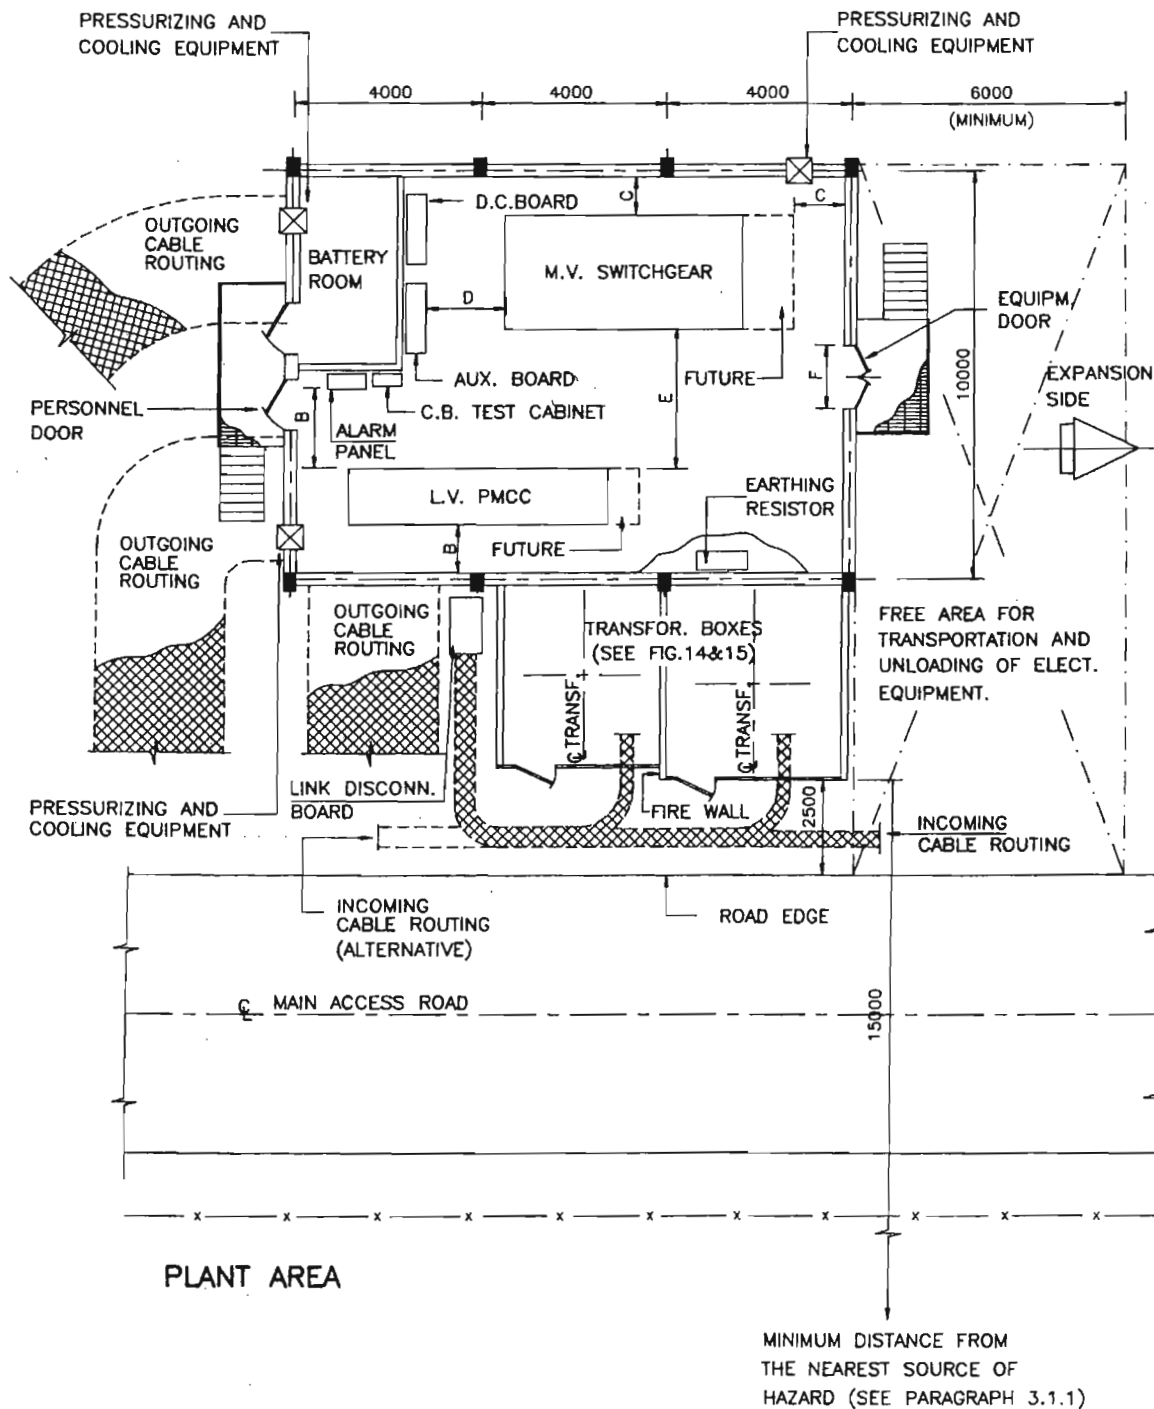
LAYOUT–L.V.& M.V. SINGLE ENDED SUBSTATION
